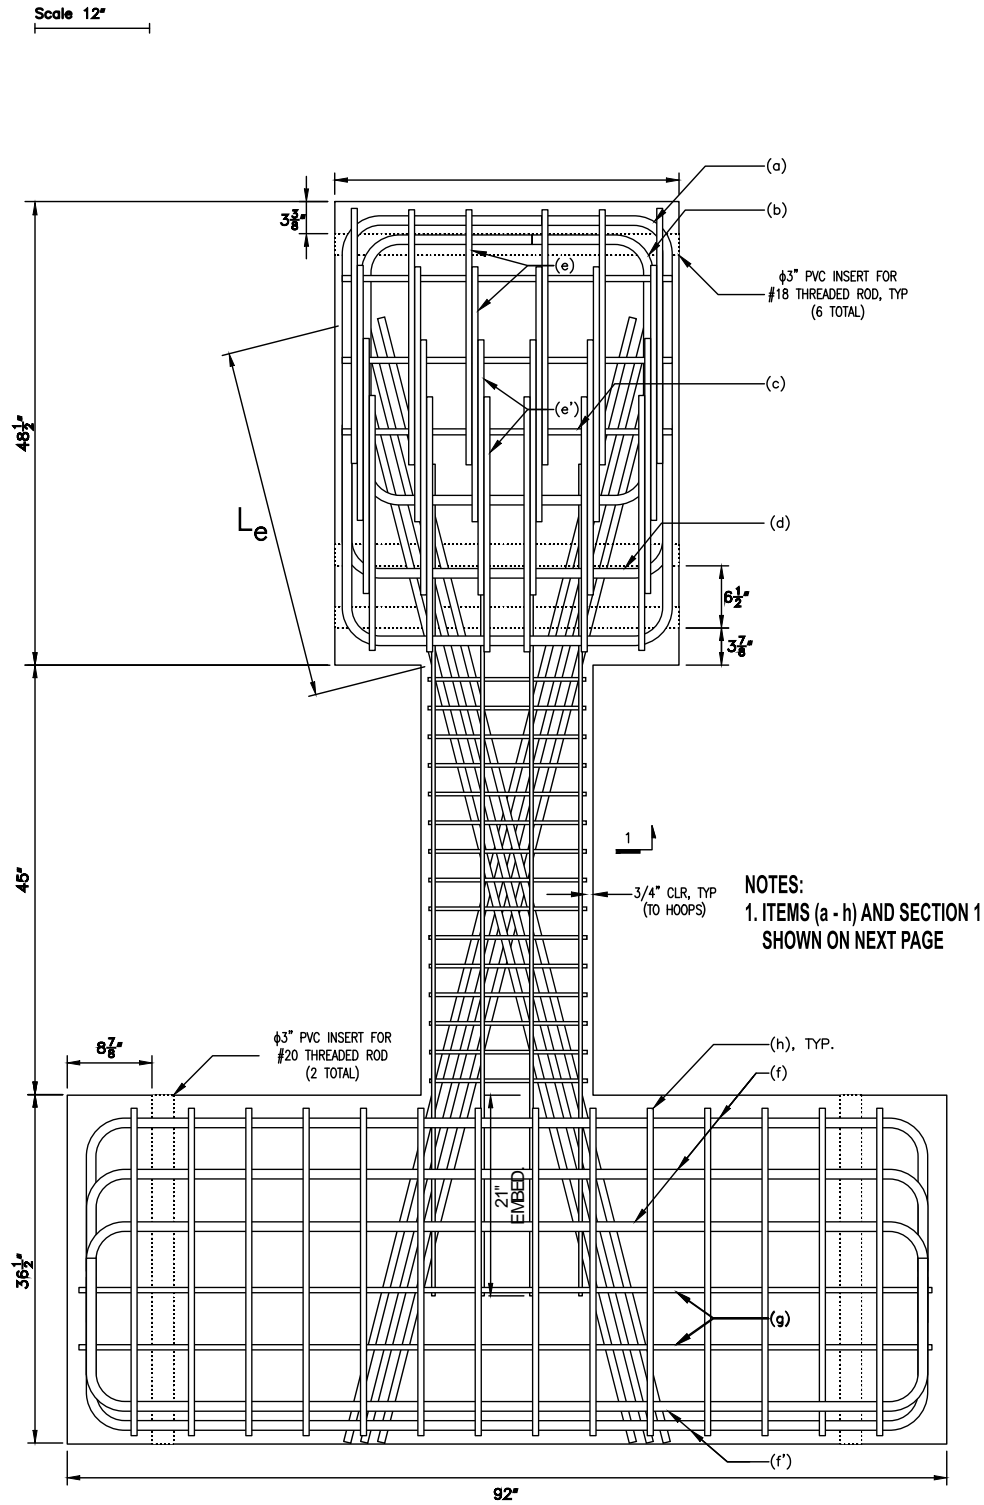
Elevation view of D120-2.5 (1 in. = 25.4 mm)
